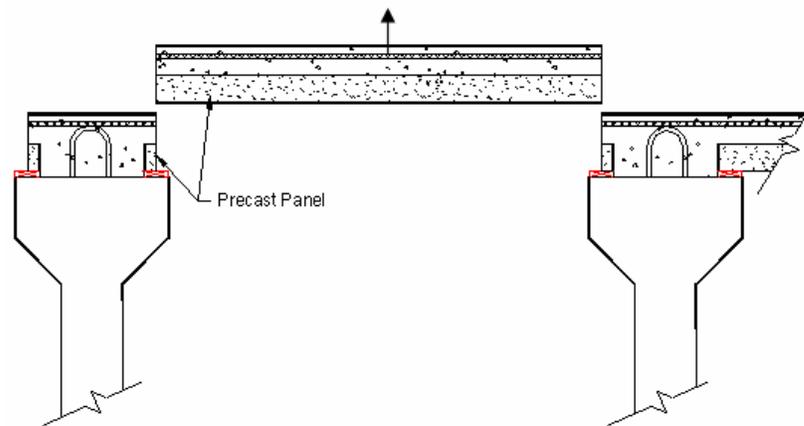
Cross Section View of Cut Pattern on Bridge #100415
